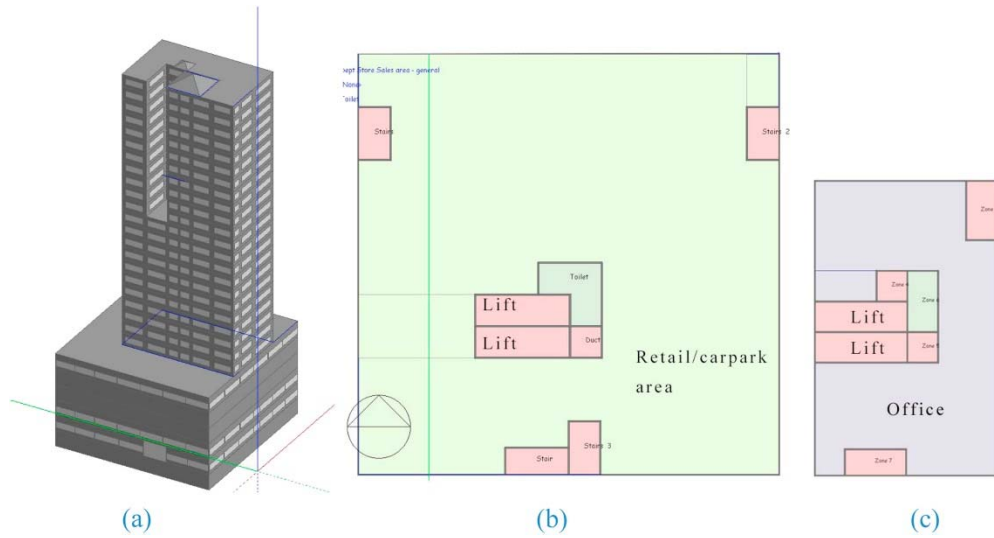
Layout of the typical commercial building in Hong Kong
